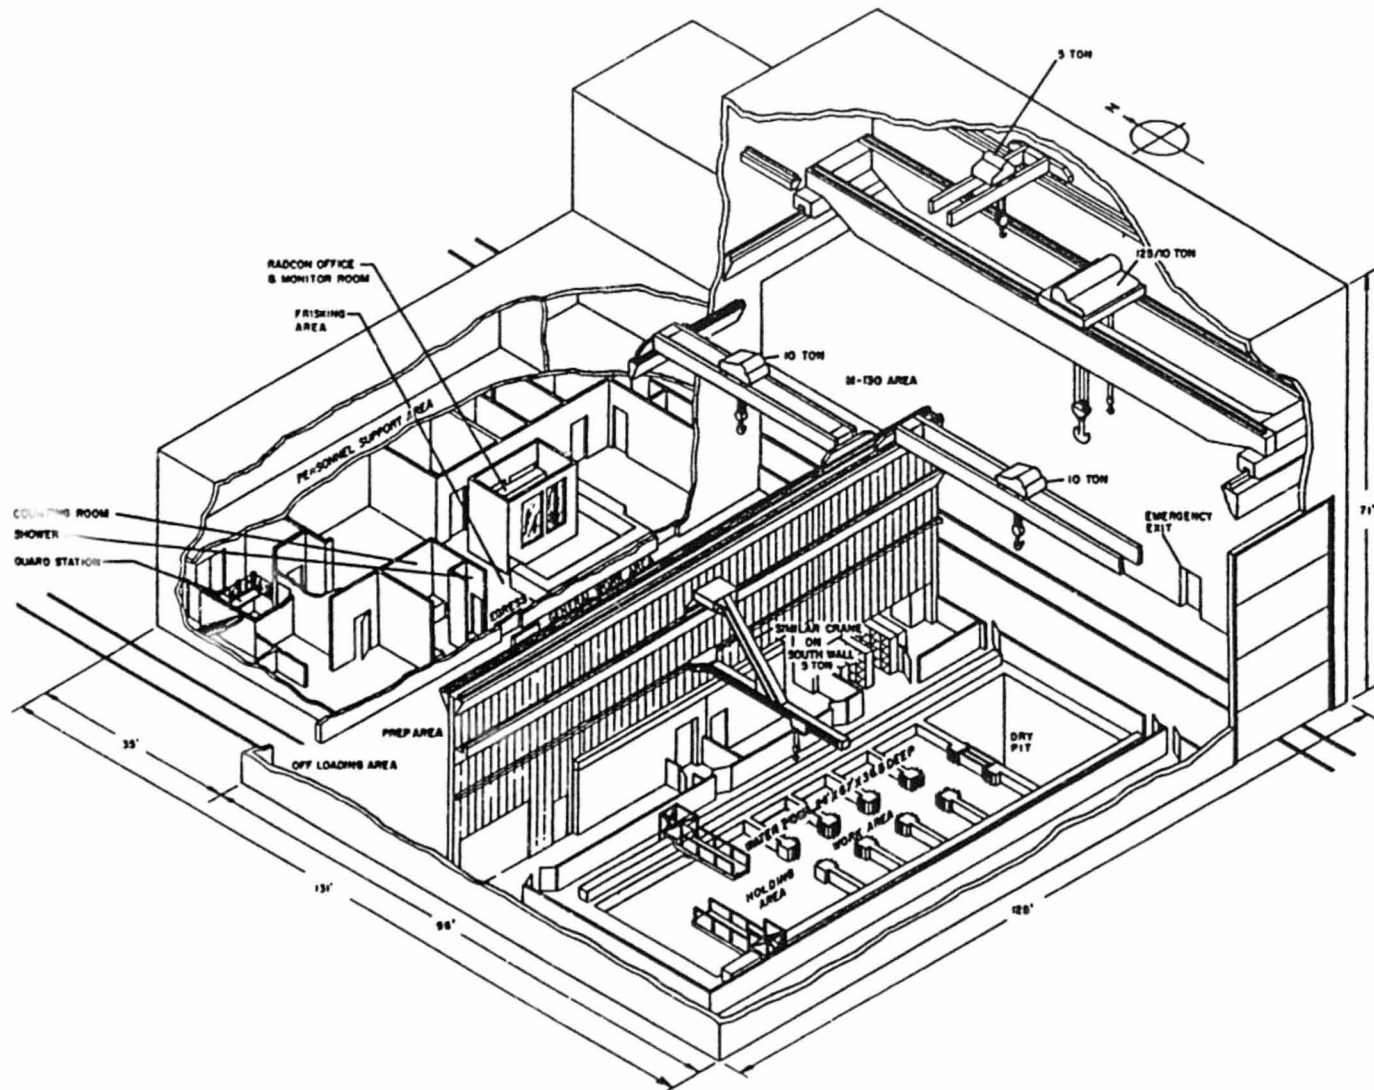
Puget Sound Naval Shipyard Water Pit Facility.
